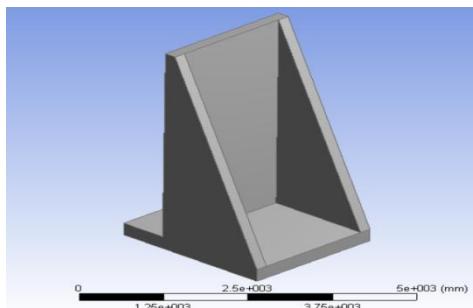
Ferrocement Rectangular Retaining Wall Of Same Dimension As RCC
